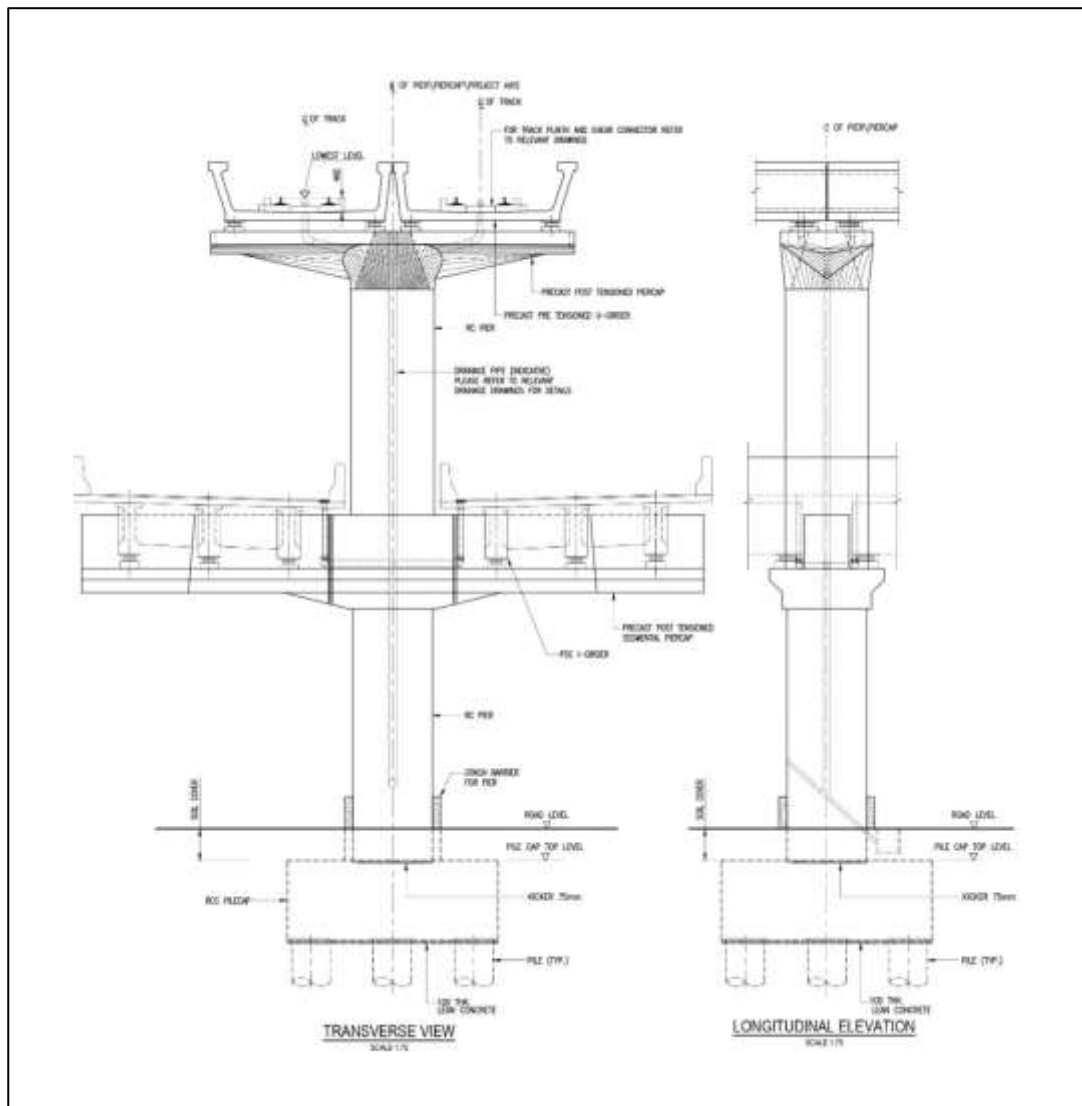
Typical Cross-section of Grade Separator and Metro Viaduct at a Pier
